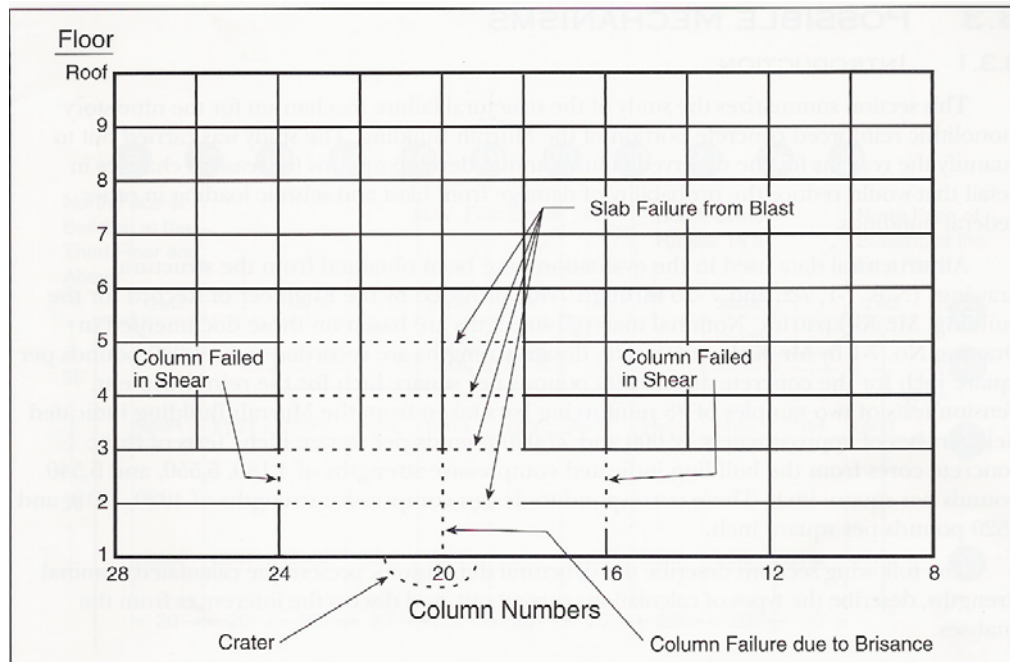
Slab Damage Predicted By BPAT North Elevation (FEMA 1996)
